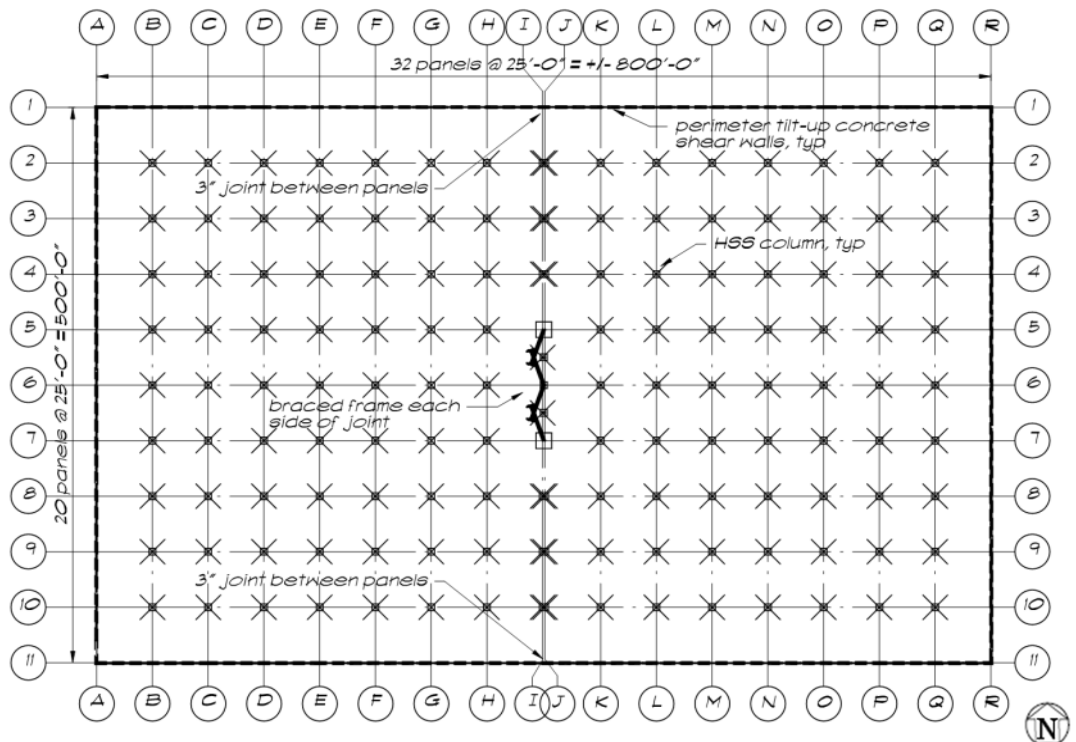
Basic foundation plan for warehouse building (all designs).
